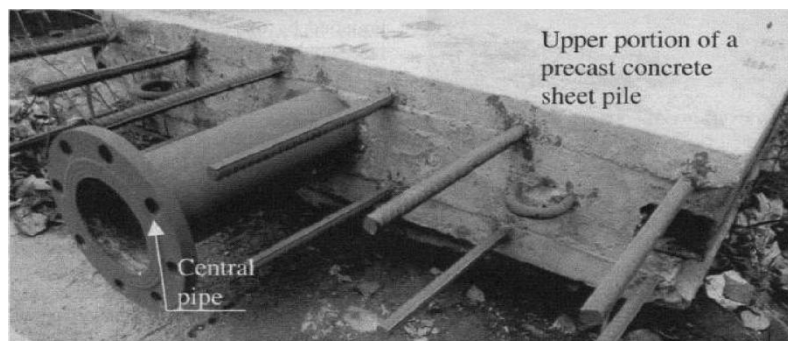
Central pipe in precast concrete sheet pile for jetting and steel reinforcements for connection
